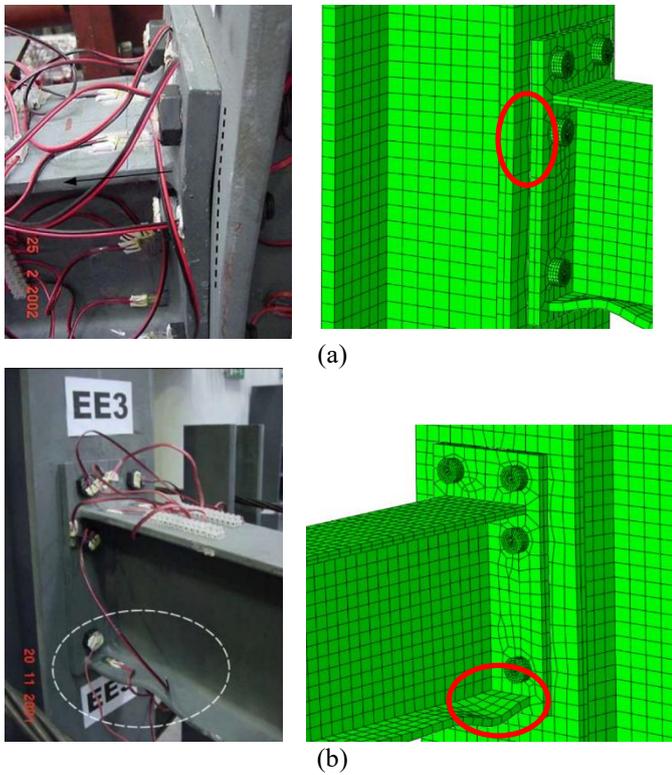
Comparison of failure modes for extended end plate joint with experiments in (de Lima et al. 2004): (a) End plate bending; (b) Beam bottom flange bending
